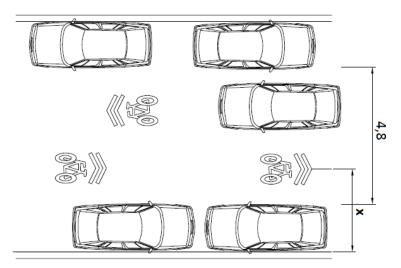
Sharrow solution on-street parking in Nedre Bakklandet
